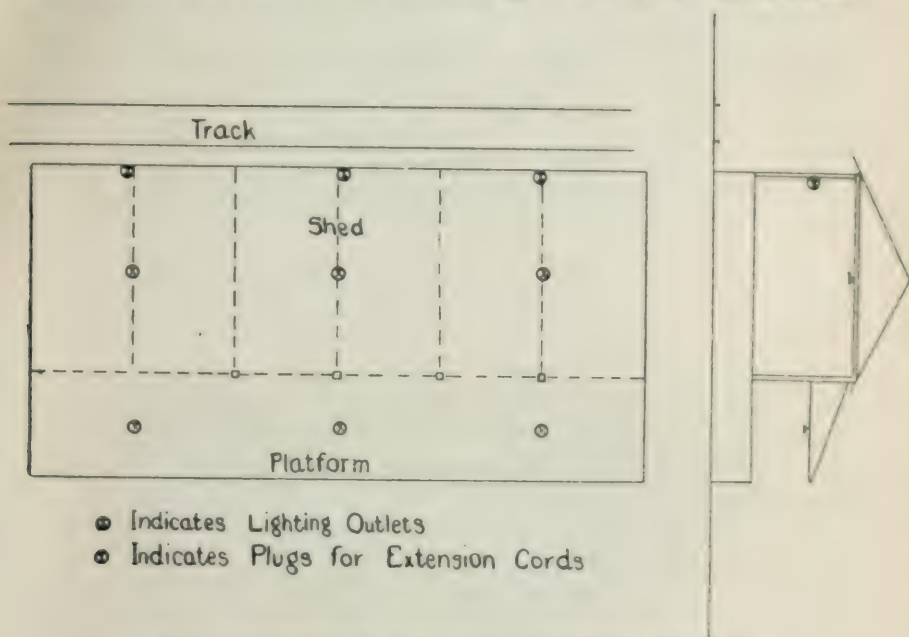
Diagram showing lighting layout typical small freight shed.
